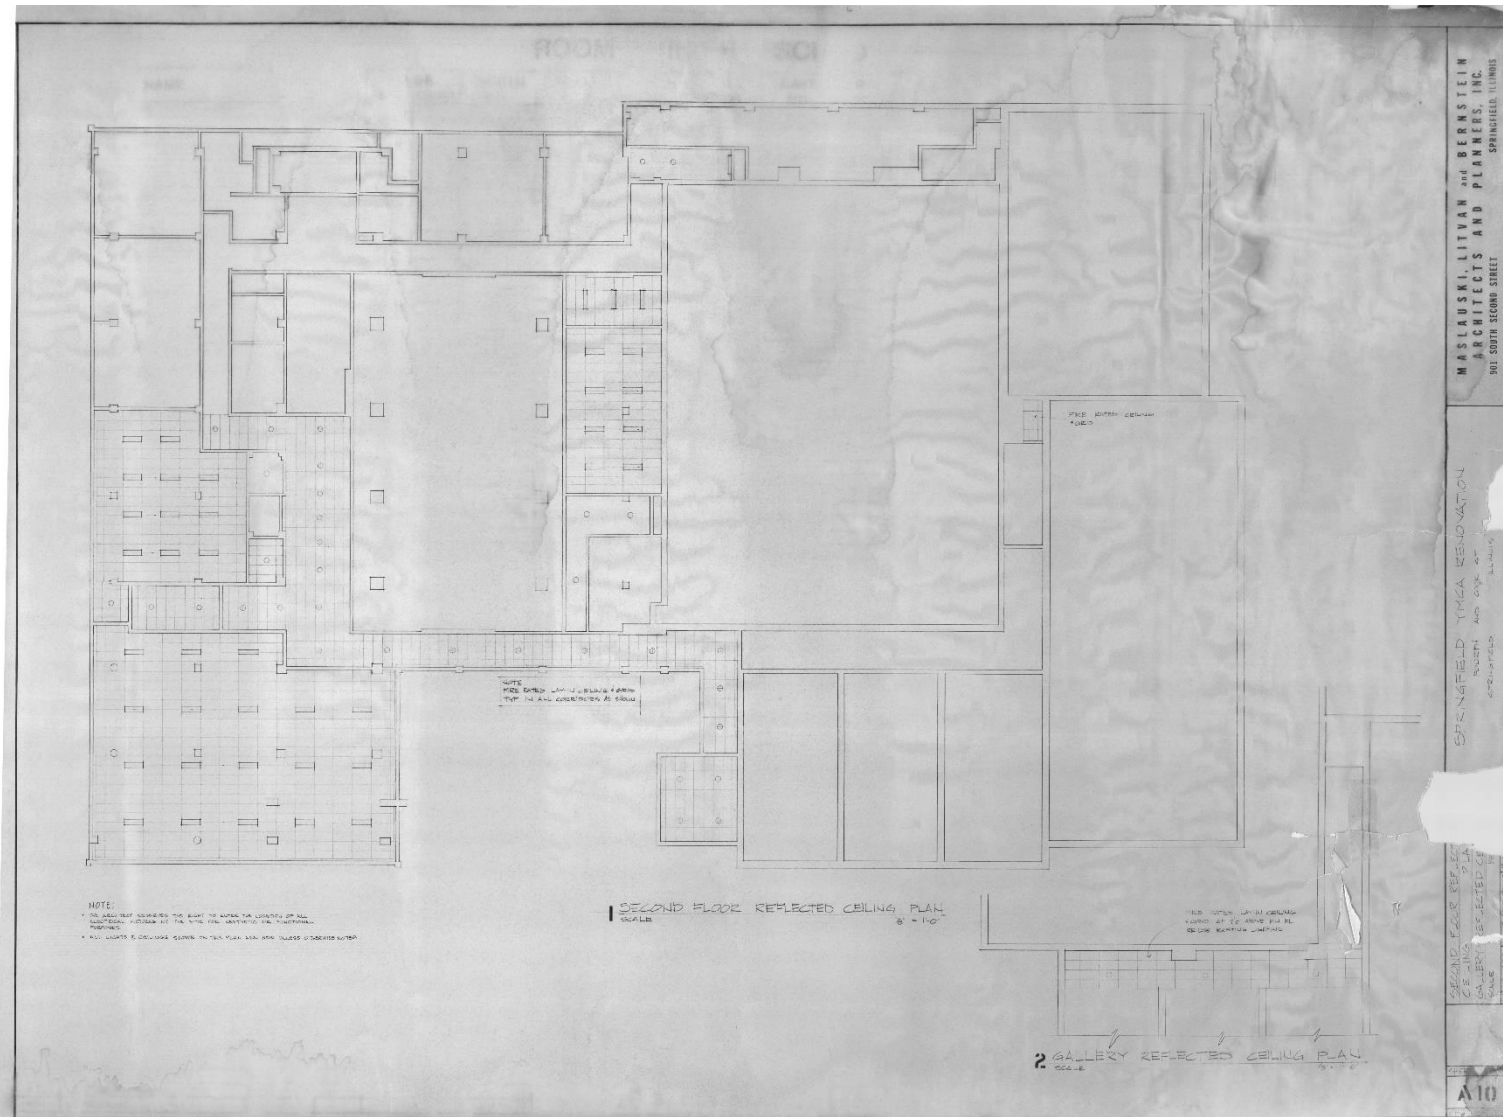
Second Floor Reflected Ceiling Plan, Springfield YMCA Renovation (Maslauski, Litvan and Berstein 1975: Sheet No. A10). [December 8, 1975].
